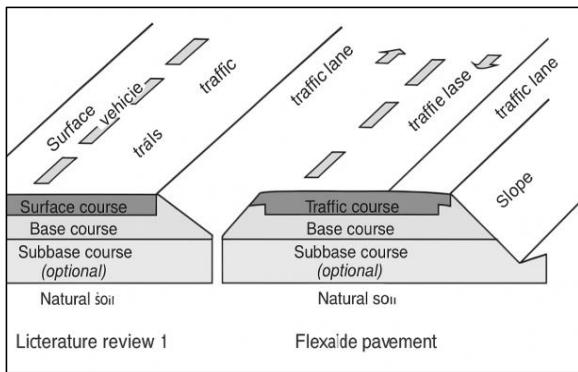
Cross-Section of Conventional and Flexipave Pavement Structures (Yunus, 2024).
